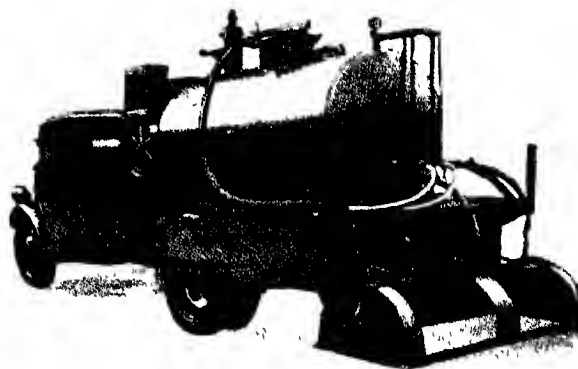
MECHANICAL COLD EMULSION SPRAYING MACHINE
